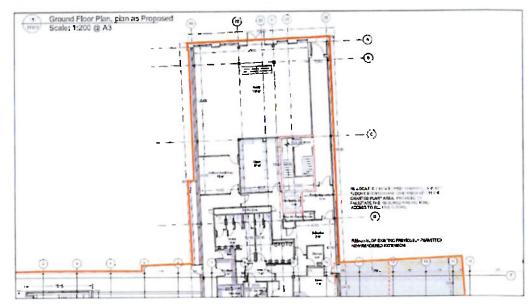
Permitted Ground Floor Layout of Nos. 17/18 Parnell Place.
